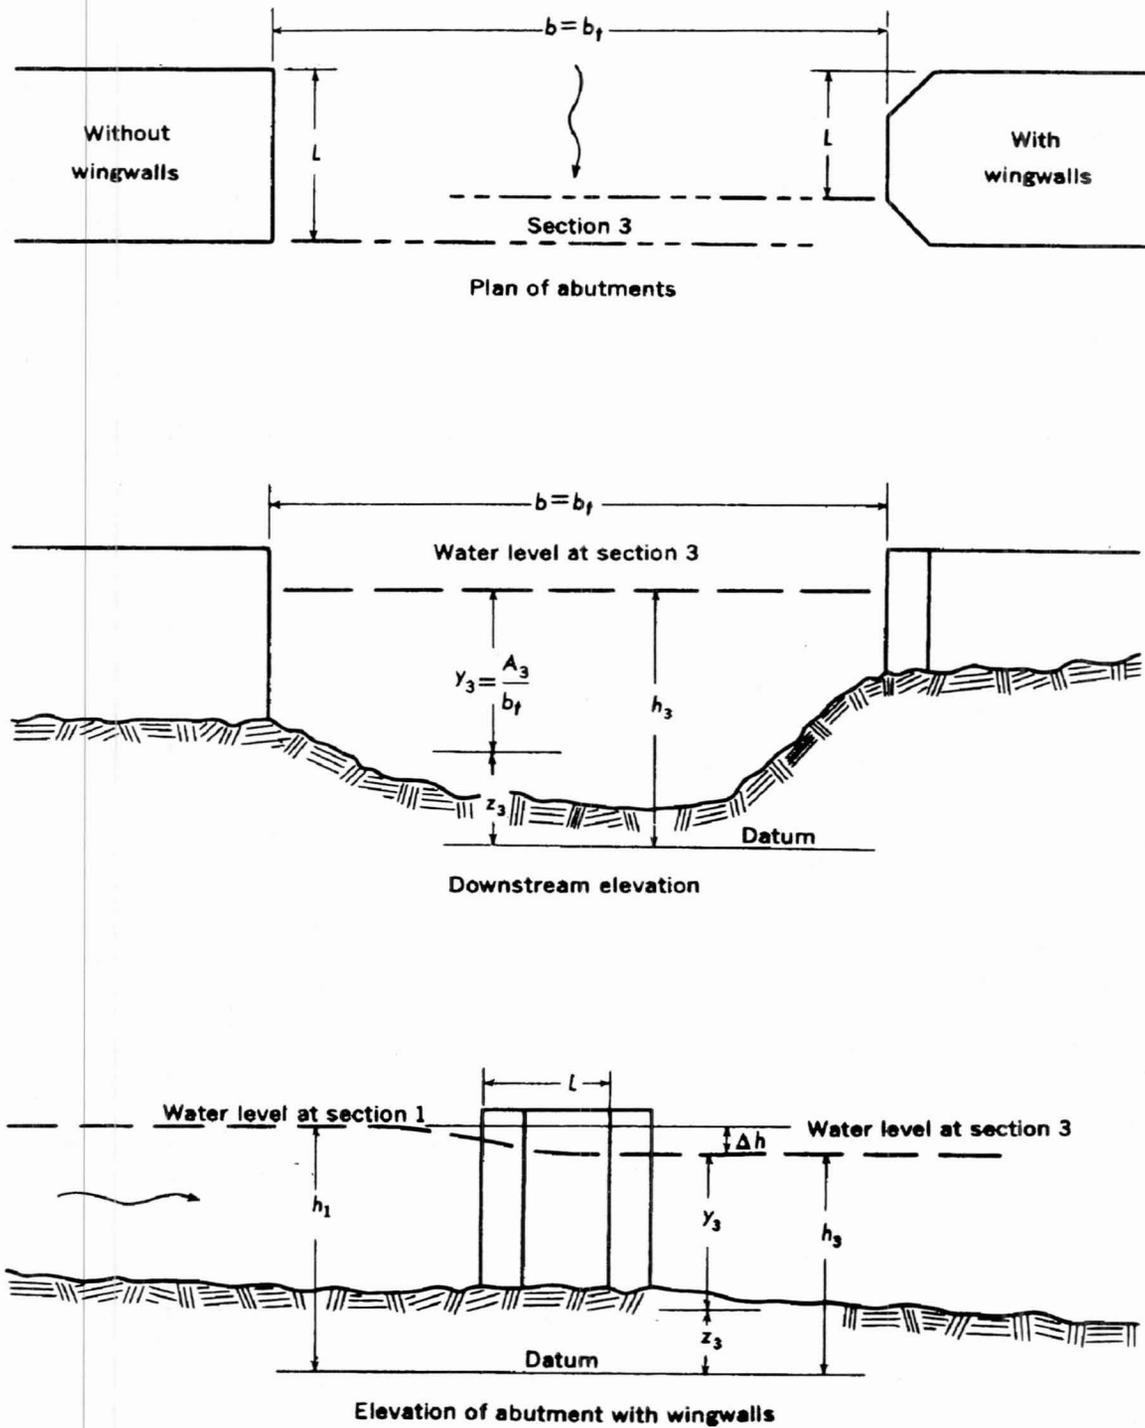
Definition sketch of type 1 opening, vertical embankments and vertical abutments, with or without wing walls (after Matthai).
